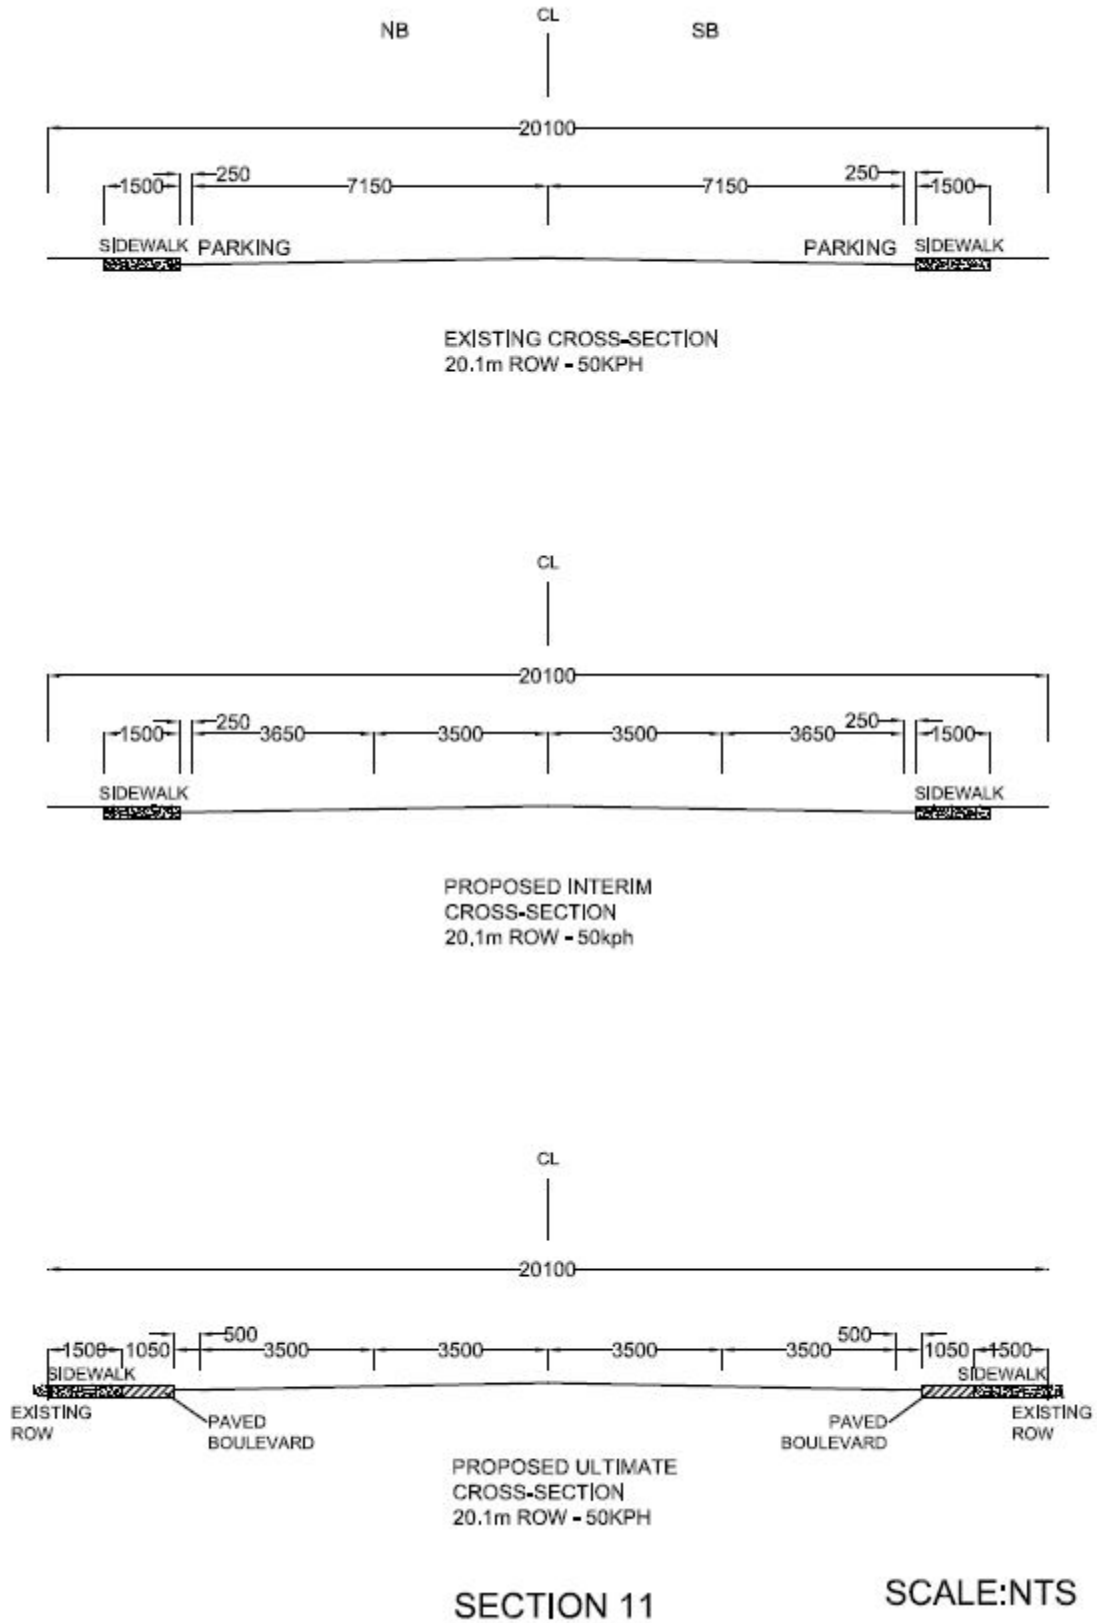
Proposed Section 11 – Hwy 22 South of 2nd Ave
